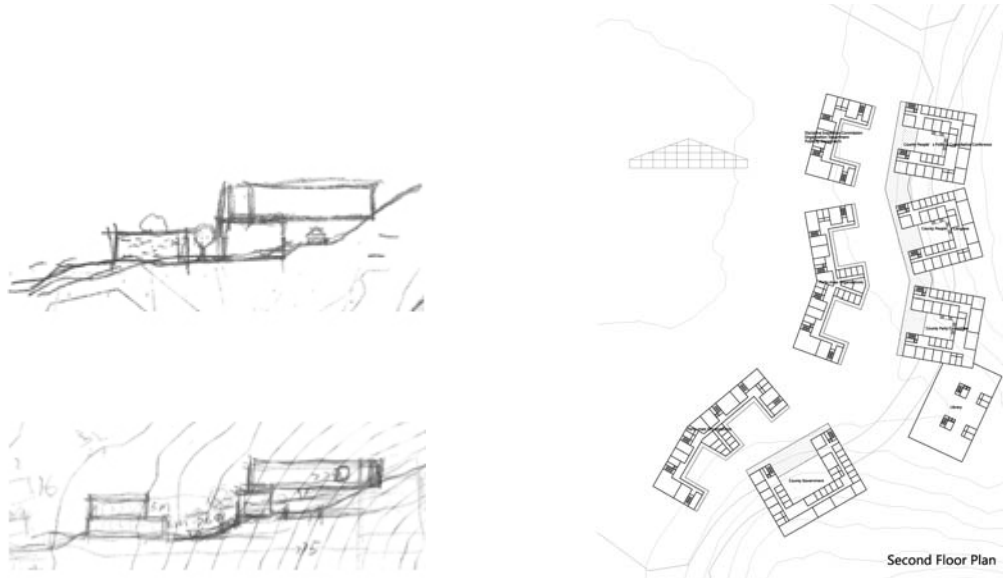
Early section sketches and second floor plan showing the vertical combination by Tao Yang
